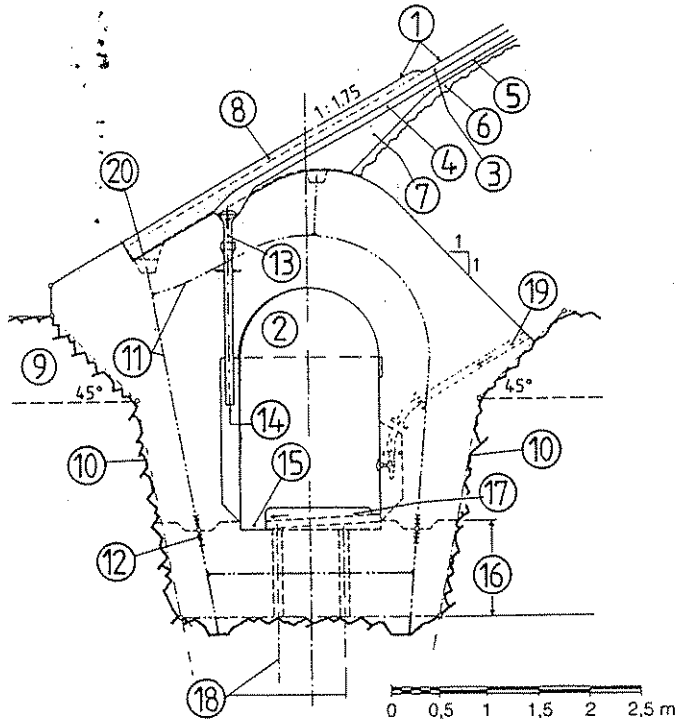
Embankment dam with controlled face sealing of asphaltic concrete. Junction of the membrane and a gallery structure (adapted from Haug & Rothacker 1989).
